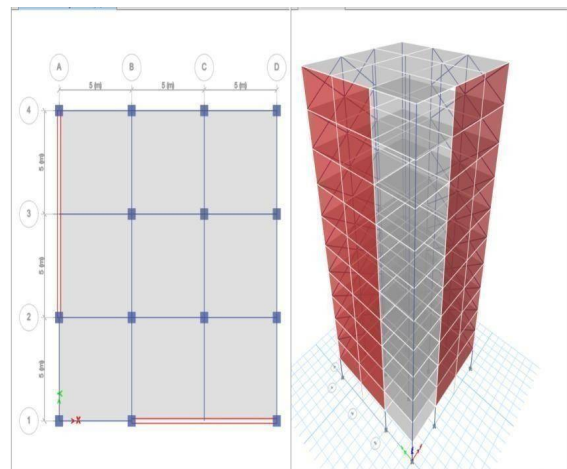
Moment Resisting Frame with shear walls positioned at two longitudinal bays at corners and at two transverse bays at corners, while Steel X Bracing is placed in similar ways as shear walls at corners (Model 6).
